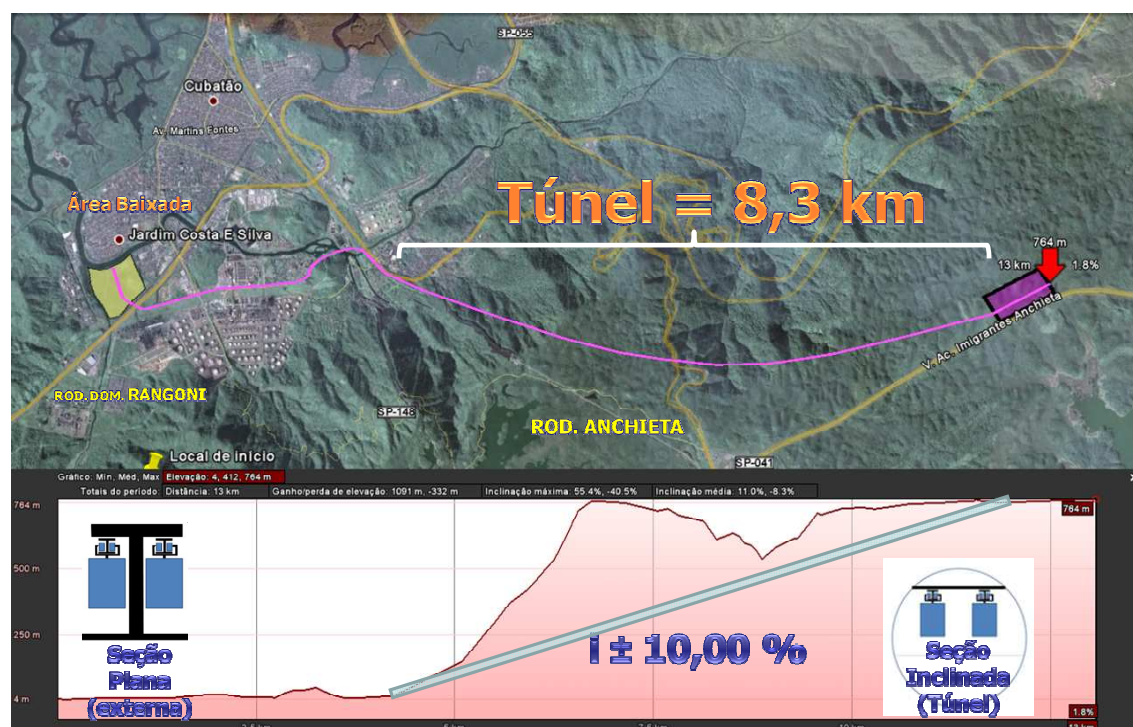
Solution: Suspended rail through tunnel – Anchieta Imigrantes⁶⁵
